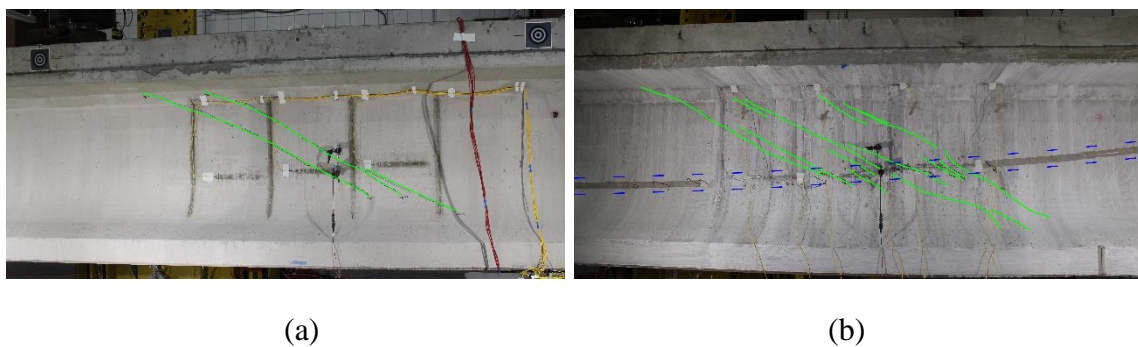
Full-depth web cracks (a) no duct specimen (b) specimen with duct
